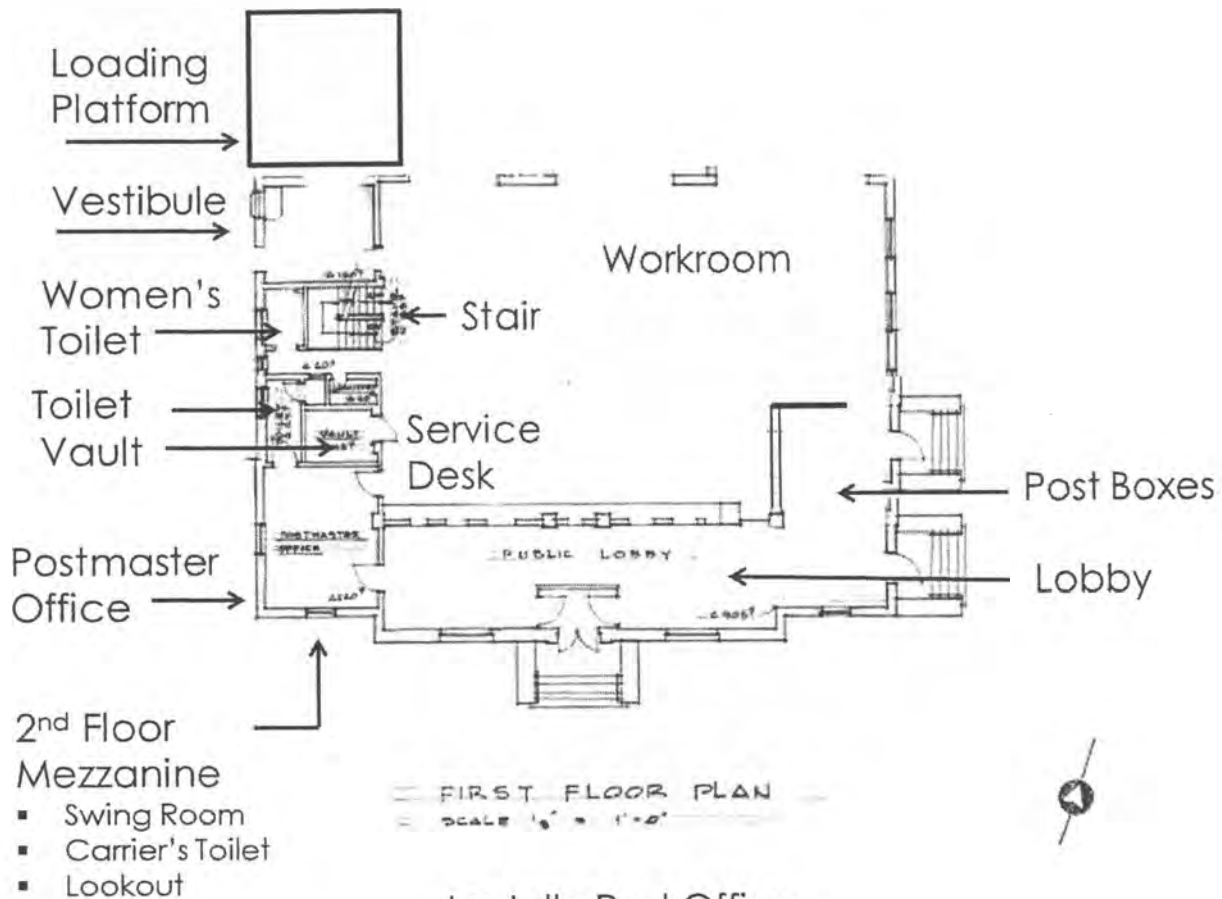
1935 Floor Plan Reconstructed from 1960 First Floor Plan. Original blueprints illegible when printed.
